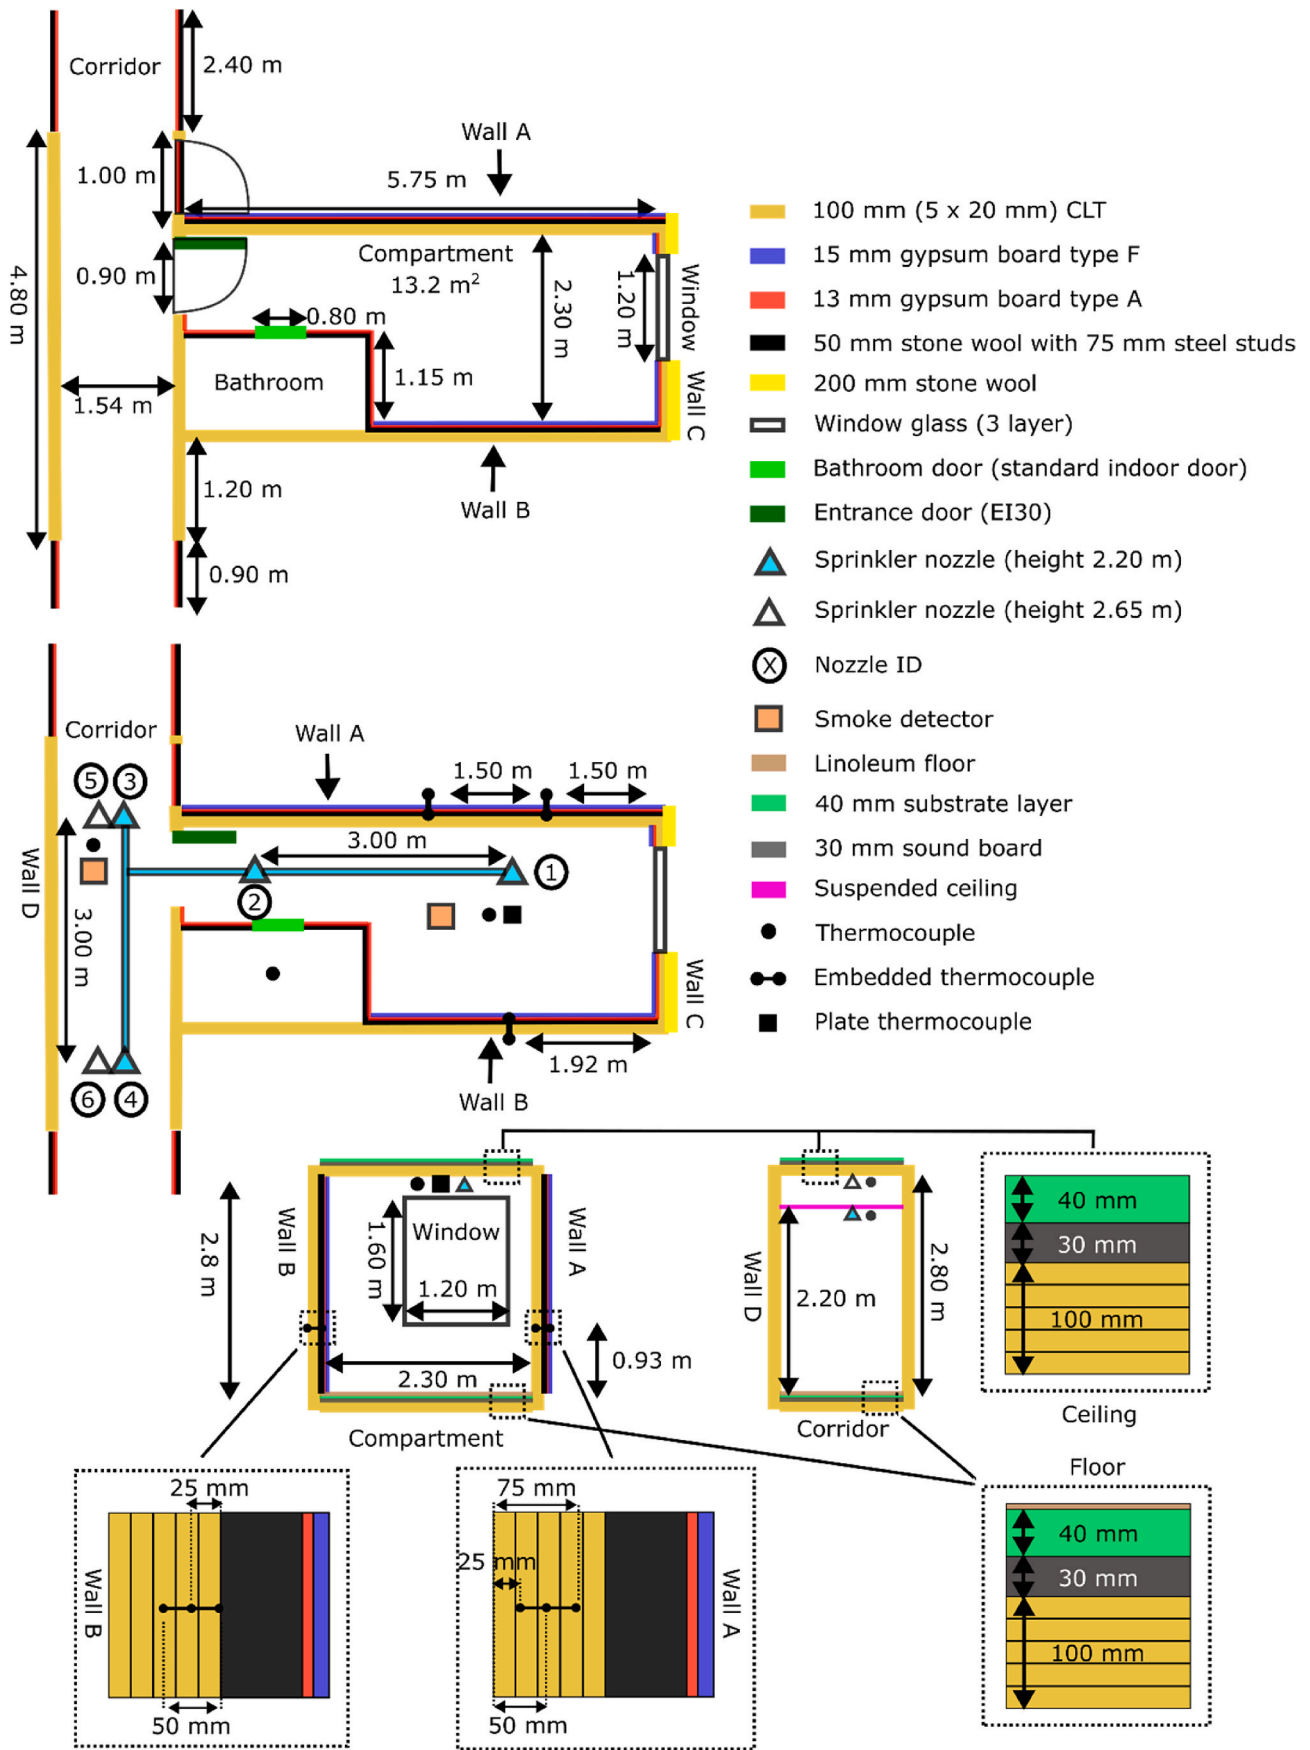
Overview of geometry and instrumentation of the experimental setup. Horizontal cross-section of the compartment and corridor (above), vertical cross-section of the compartment and corridor (middle), detailed cross-section of Wall A and B, floor and ceiling (below). Illustration by FRIC.
